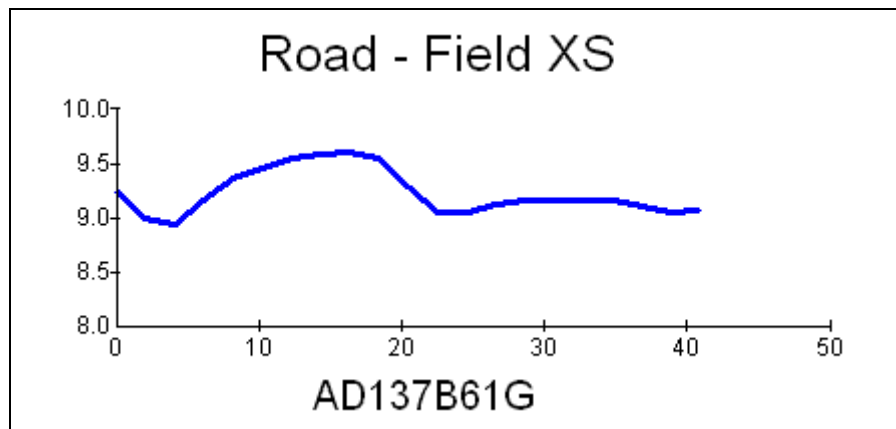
Cross section of road and drainage ditch leading to fields. All units are in meters.
